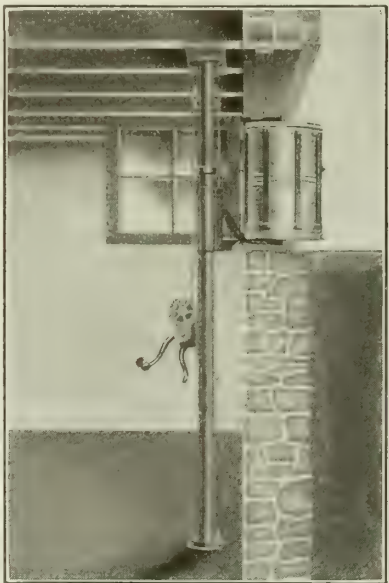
Platform Hoisted and Swung out of Window. Ash cans hoisted and swung through window over sidewalk by operator in cellar. ERNST PERFECTION HOIST
